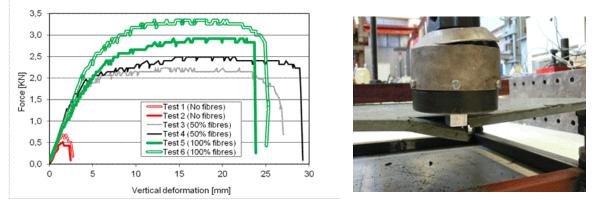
Improvement of the load bearing capacity of thin plates (d=15 mm) due to steel fibres ($L_f=13 \text{ mm}$) a) load–deformation curves and b) local failure of Plate 3 with 77.5 kg/m³ fibres [18].
